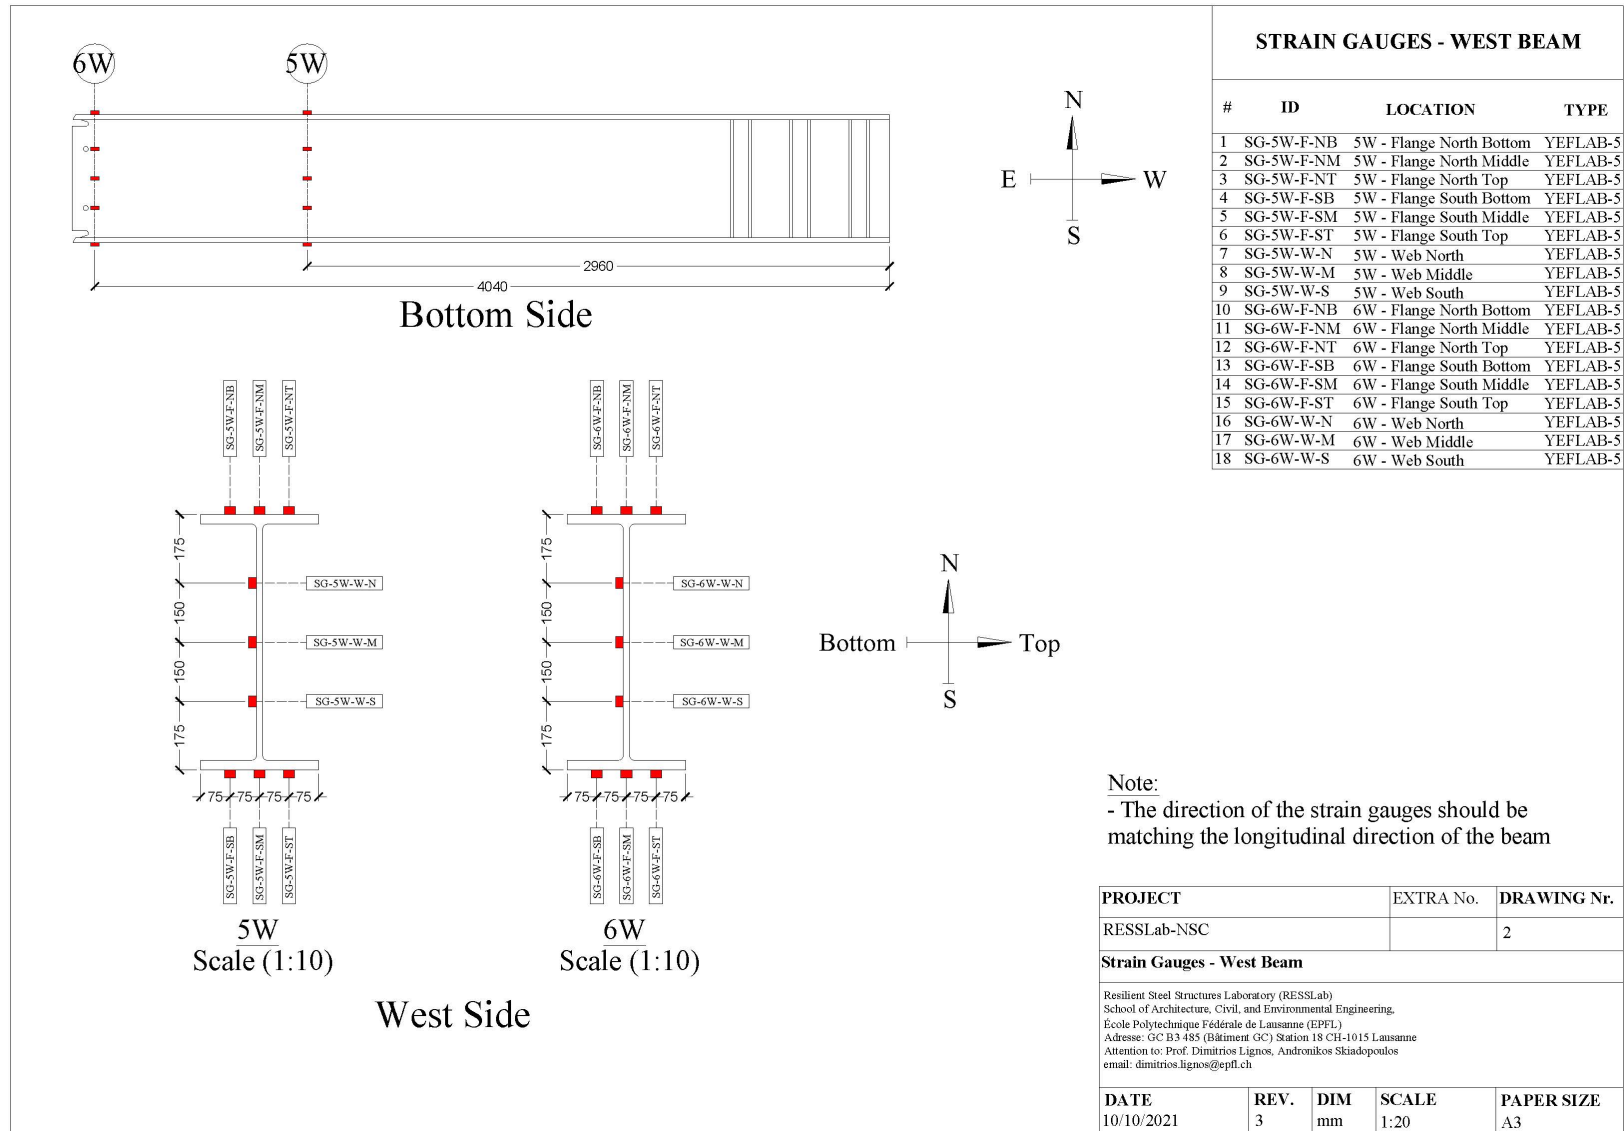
Instrumentation plan – west beam strain gauge drawings.
